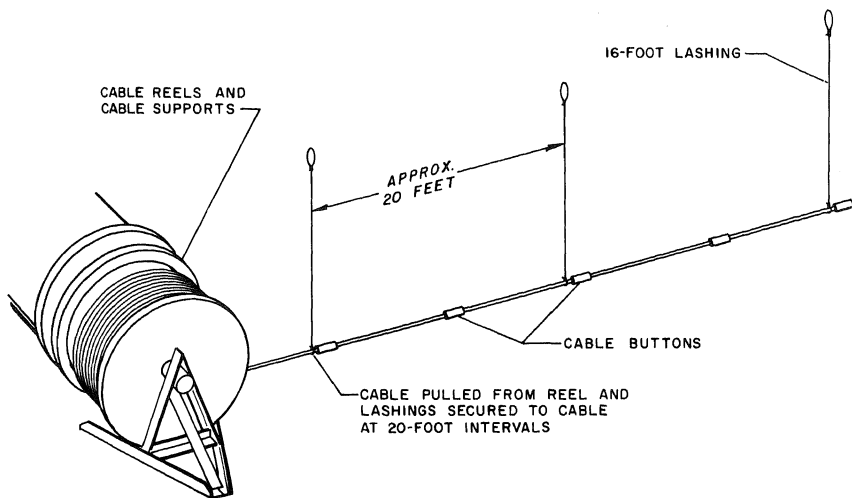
Unwinding cable from cable reel and installing rope lashings.
